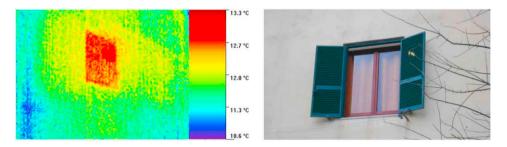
A detail of Infrared and normal picture of South Elevation.
